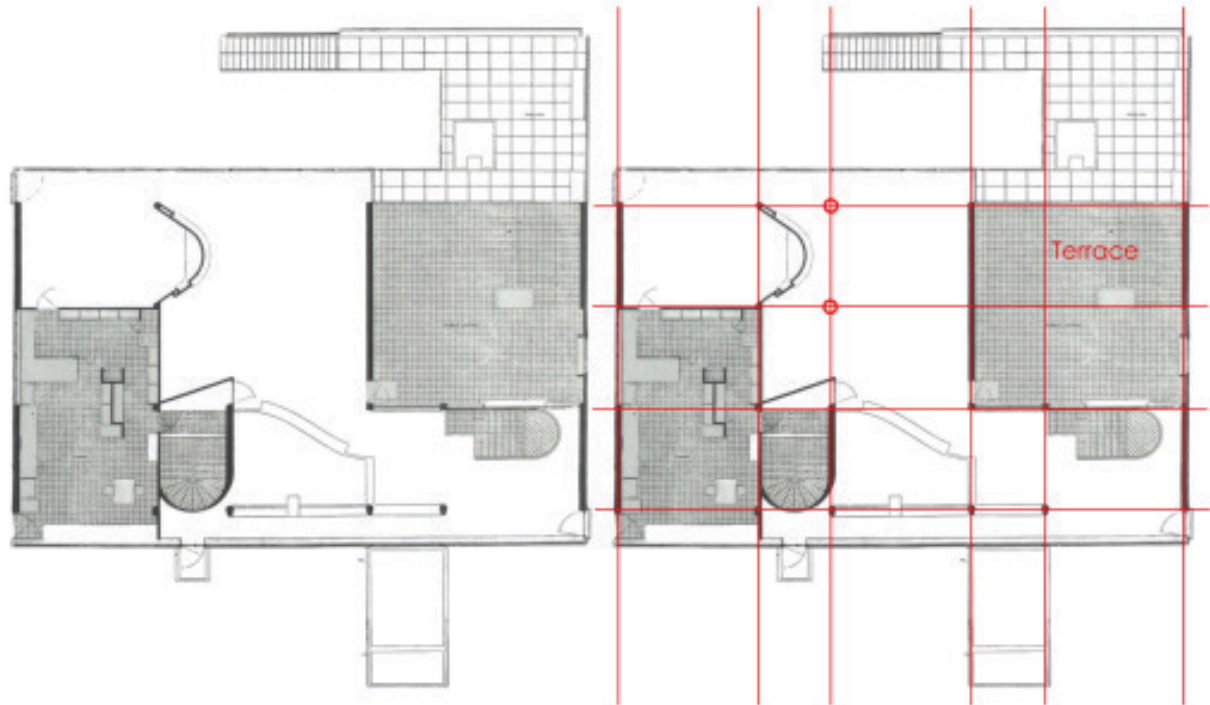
Le Corbusier and Pierre Jeanneret. L: First floor plan of the Villa Stein-de Monzie at Garches, as it appeared on page 142 of the *Œuvre Complète de 1910-1929*. R: Same plan with column grid and two missing columns highlighted by author.
